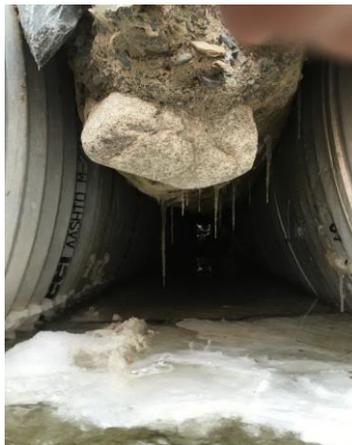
April 2017 - Post Weather Event - Culvert Backfill Washed Away
